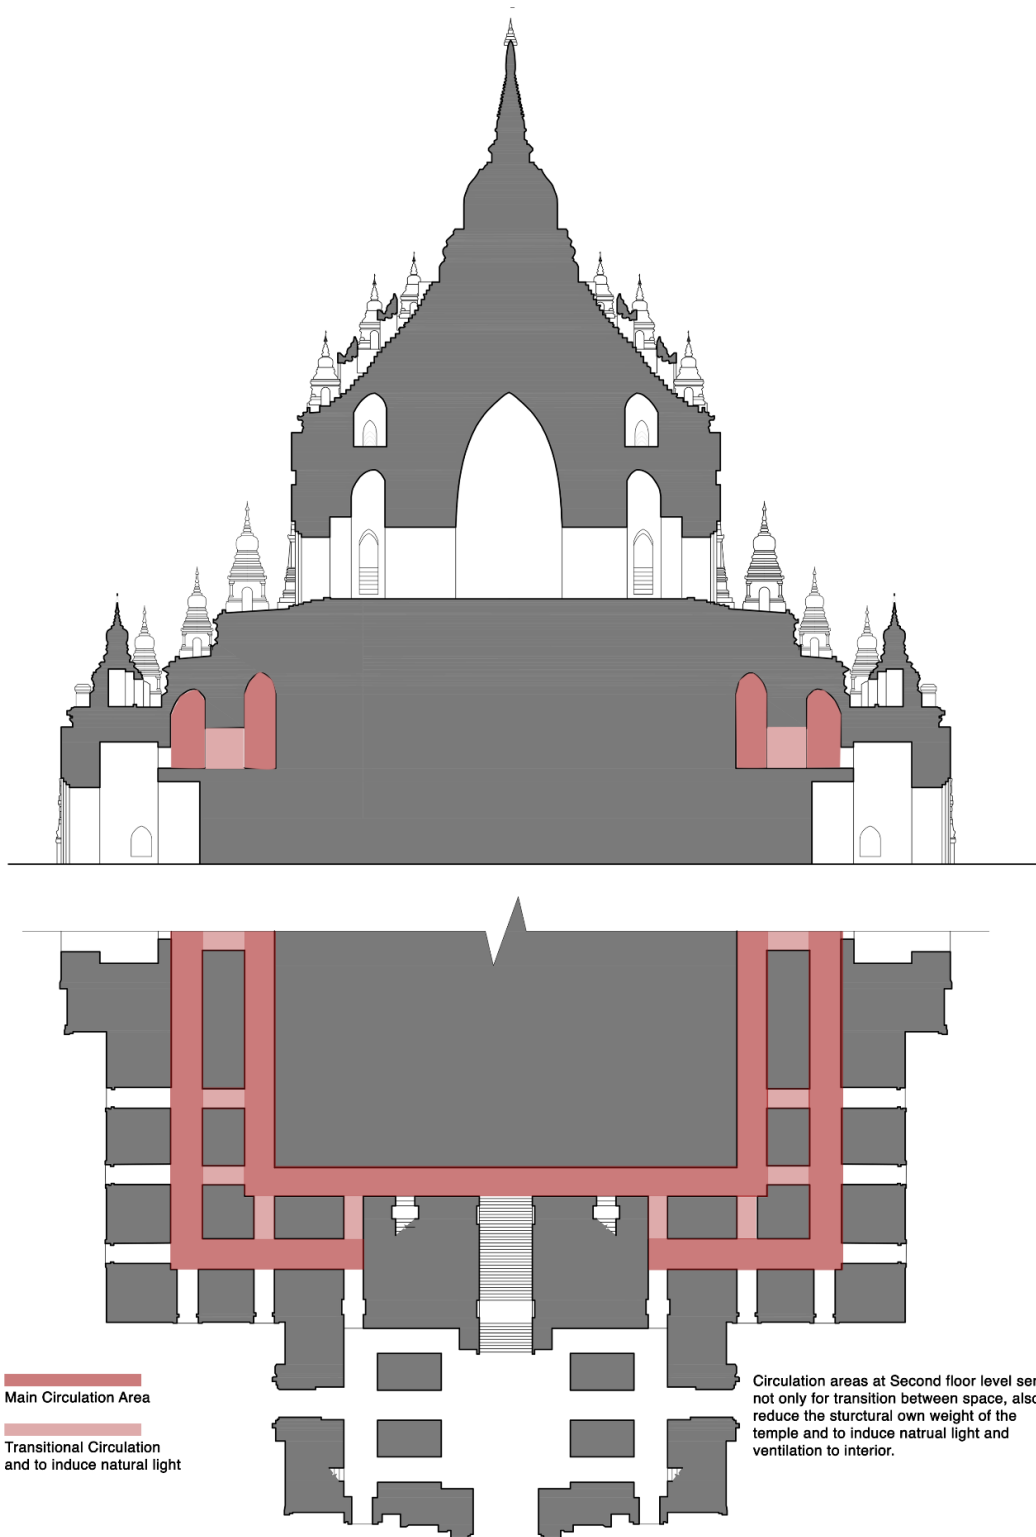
Redrew Plan to Section Drawing of Thatbyinyu Temple (Redrawn by Author)
